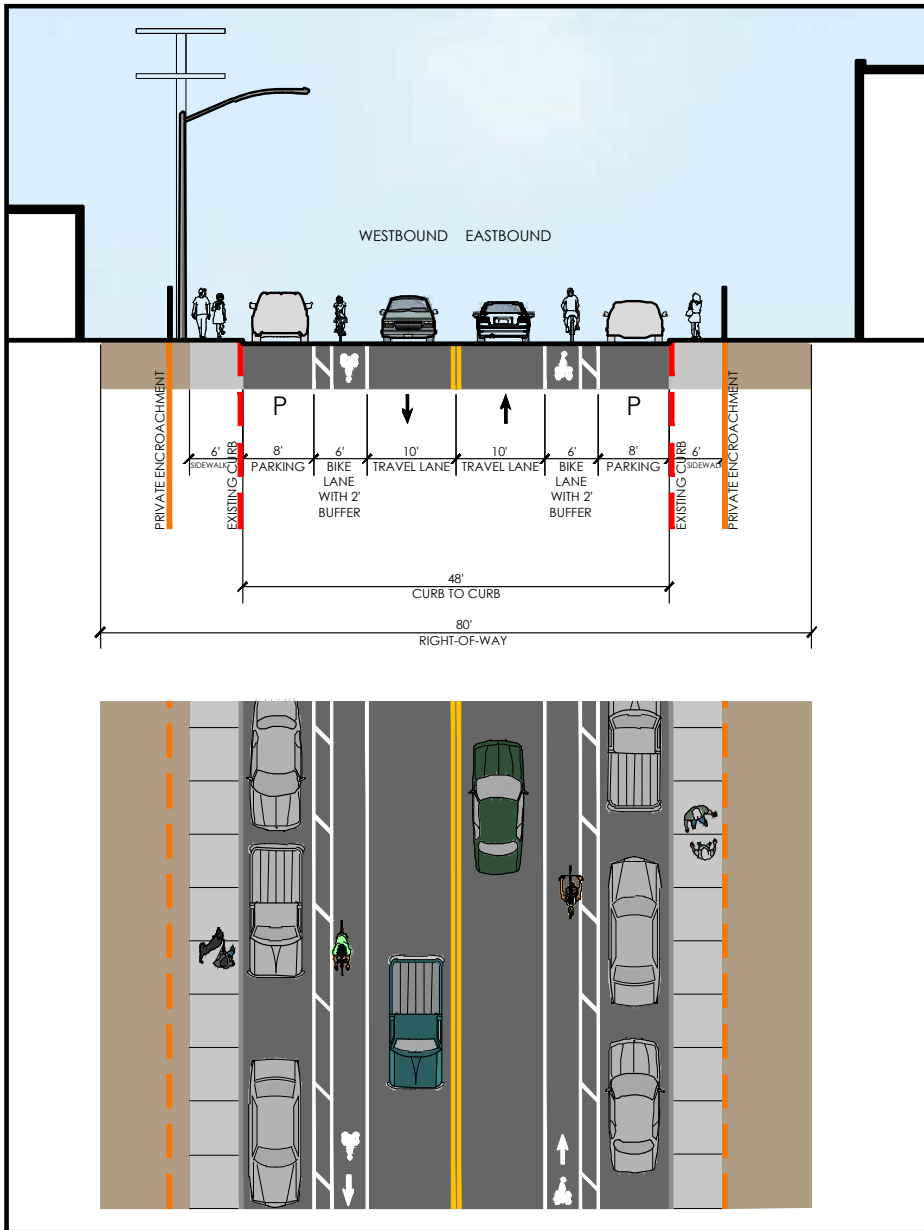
, Oak Avenue: Proposed Conditions A - Striping
